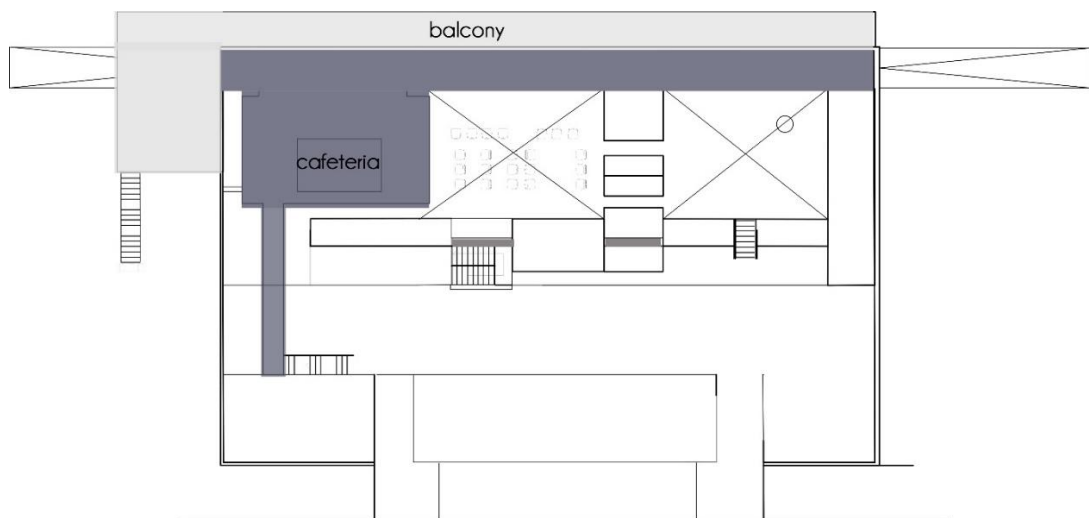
Estimated Second Floor Plan Zoning showing the Facilities (By Author).
